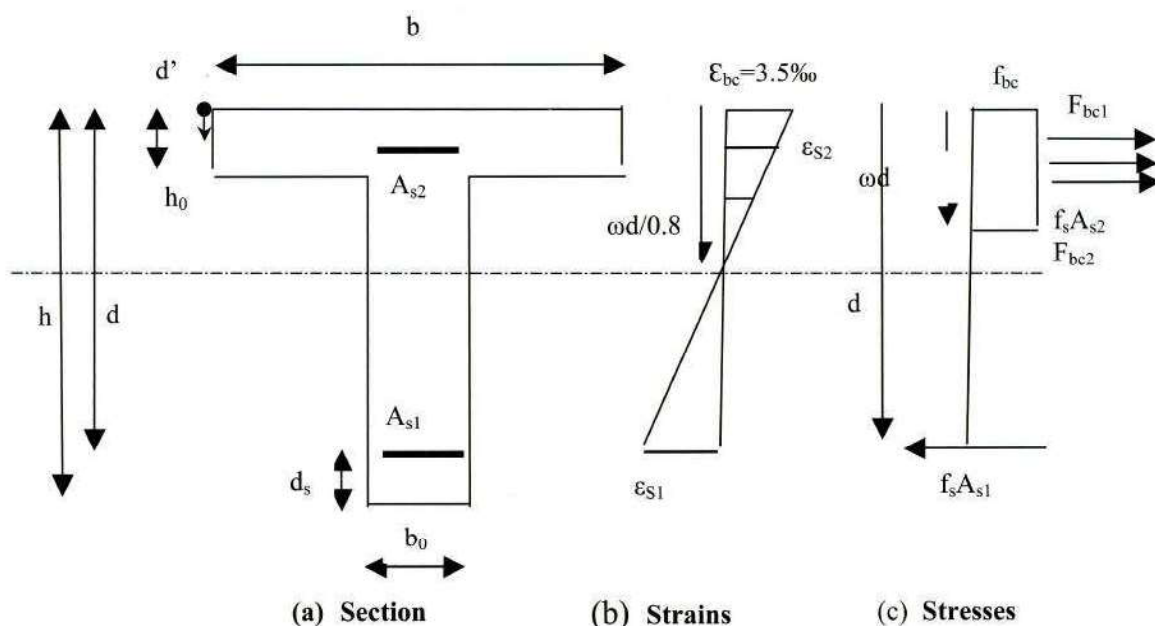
(a) Typical T-beam section; (b) Strains; (c) Stresses
